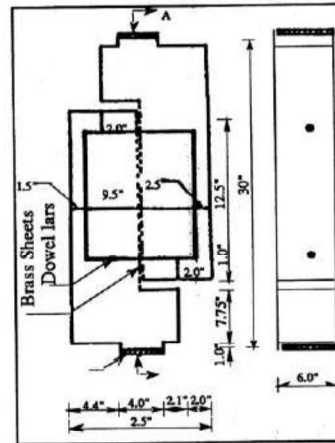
Test specimen : (a) dowel bars, (b) Section A-A.
